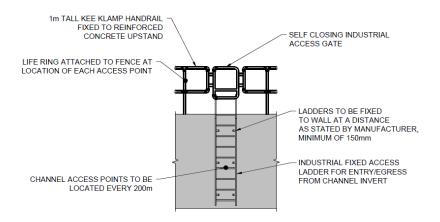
Typical channel detail (extract from drawing TW-SIZ-XX-JBAU-SB-00-DR-C-0304-S3-P01-South_Bank_Details_Sheet_4_of_4)
